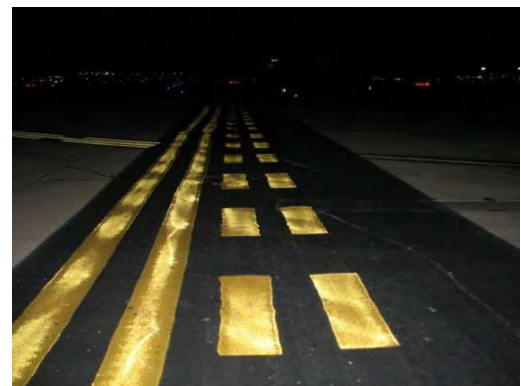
SIX-MONTH OLD HOLDING POSITION MARKING WHERE BEADS WERE HAND-THROWN.
